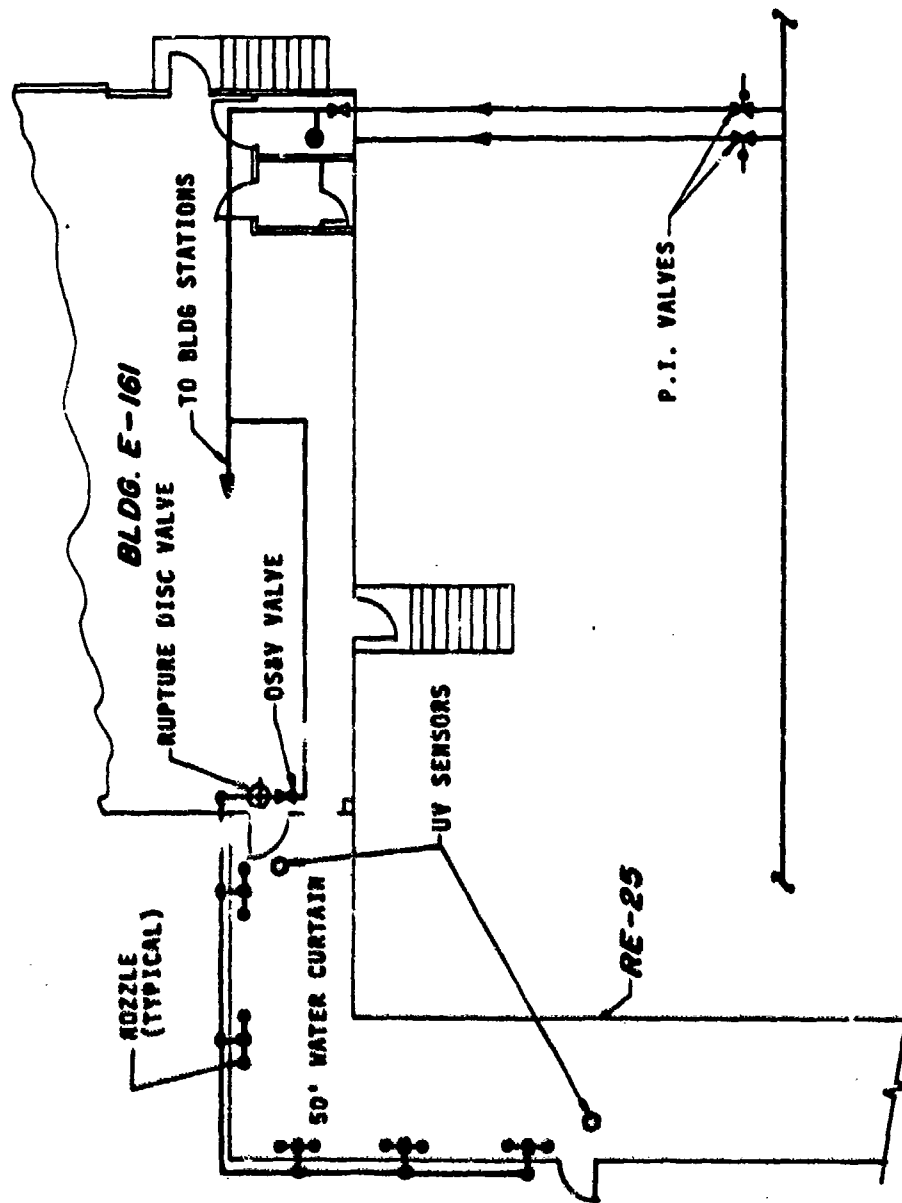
Schematic - building E-161 (partial) and ramp RE-25
